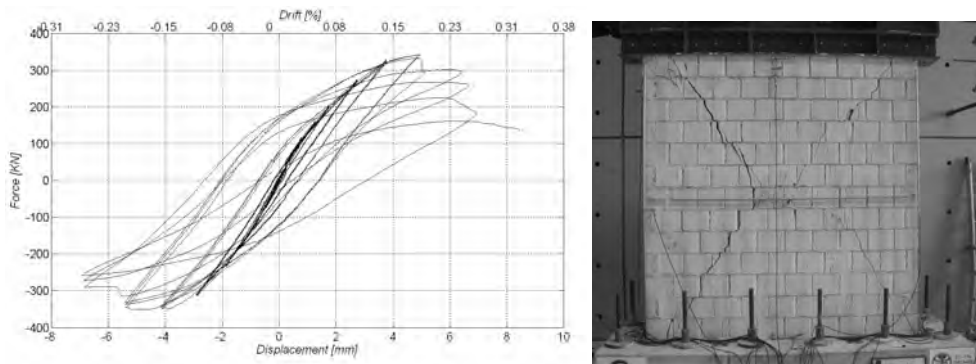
Shear test on a clay brick masonry wall. Left: shear force vs. horizontal displacement, right: crack pattern after the test (Magenes et al., 2008a and 2008c).
